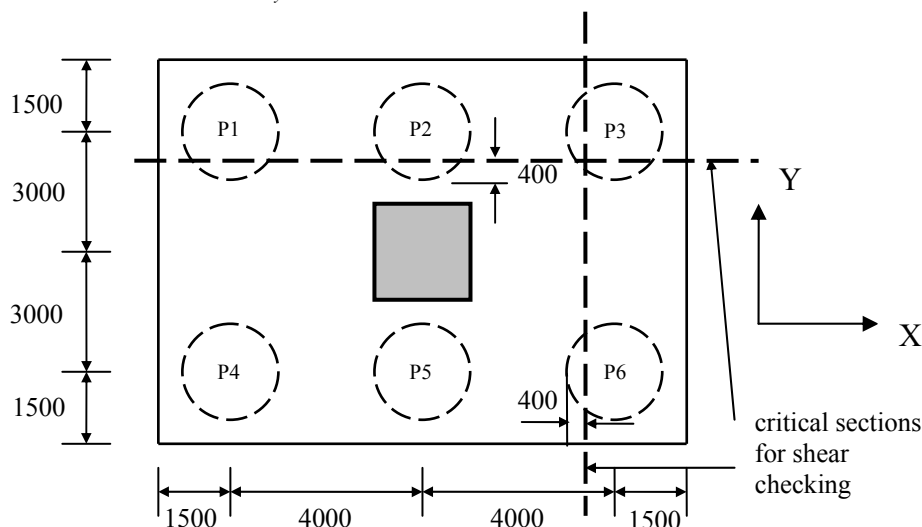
Pile Cap Layout of Worked Example 12.1
